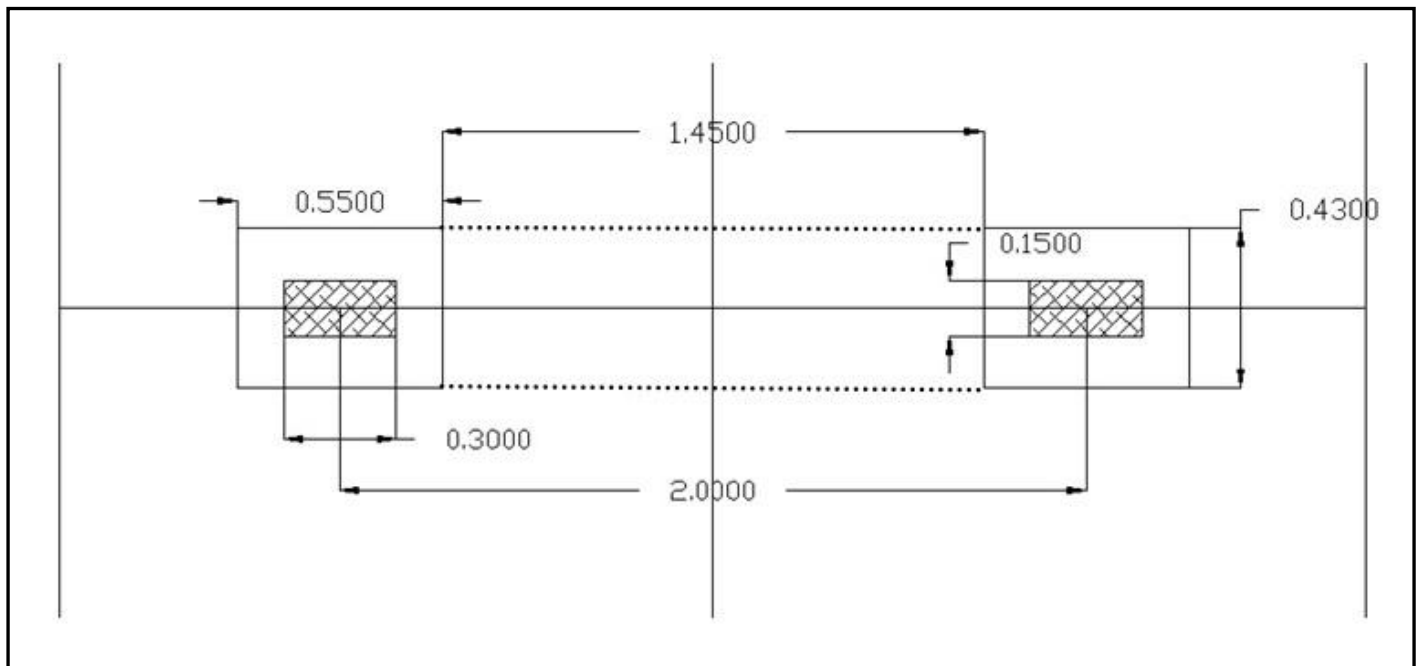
DUMMY LOAD REPRESENTATION FOR PSC BRIDGE SLAB
